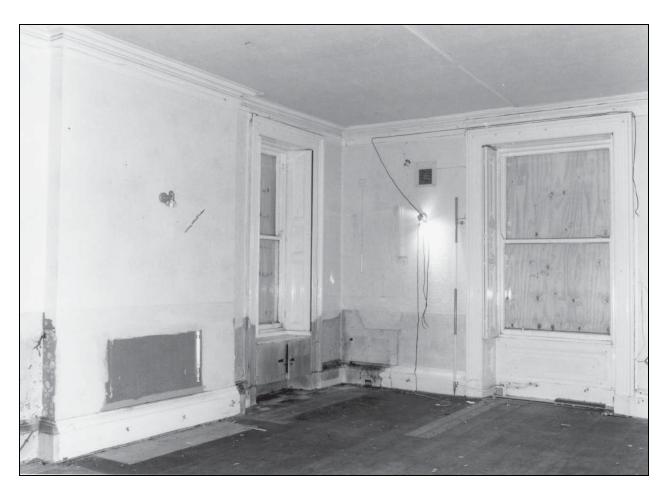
The 19th century house: north-east ground floor room, from the south-west
